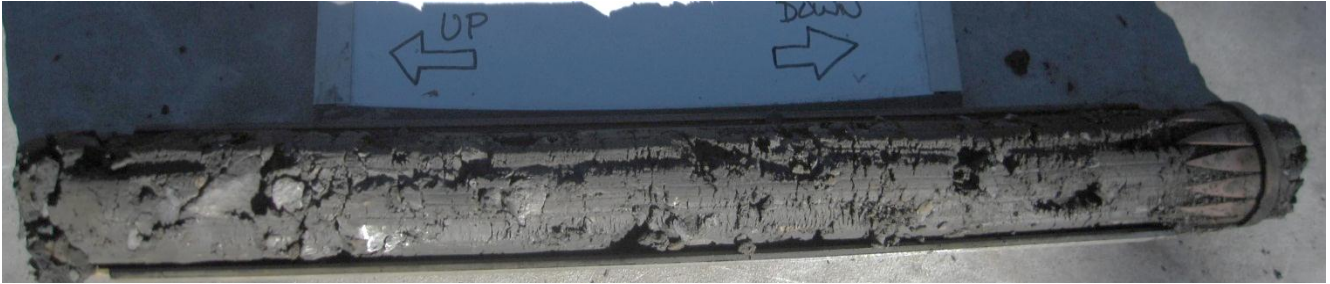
KC12-OVB45 LPT 1 of 10 (1.95 m – 2.55 m)
